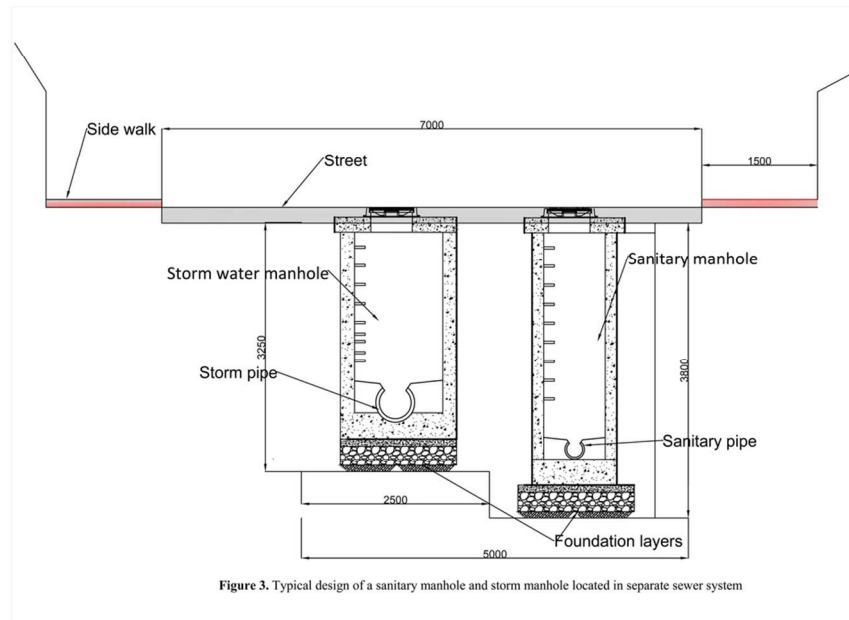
Typical design of a sanitary manhole and storm manhole located in a separate sewer system
